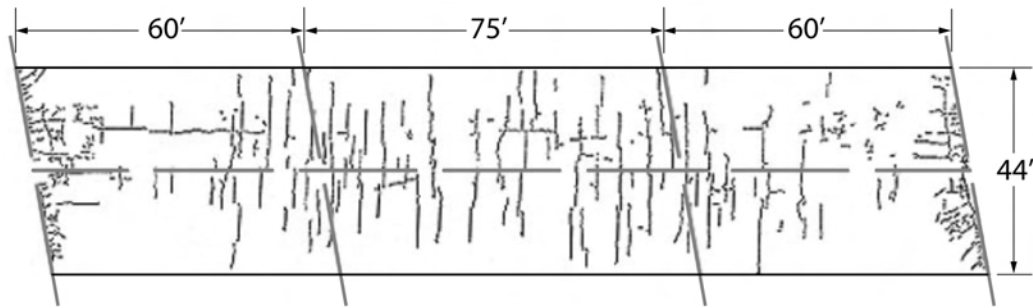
Plan view of deck cracking (adapted from Darwin et al. [39])
